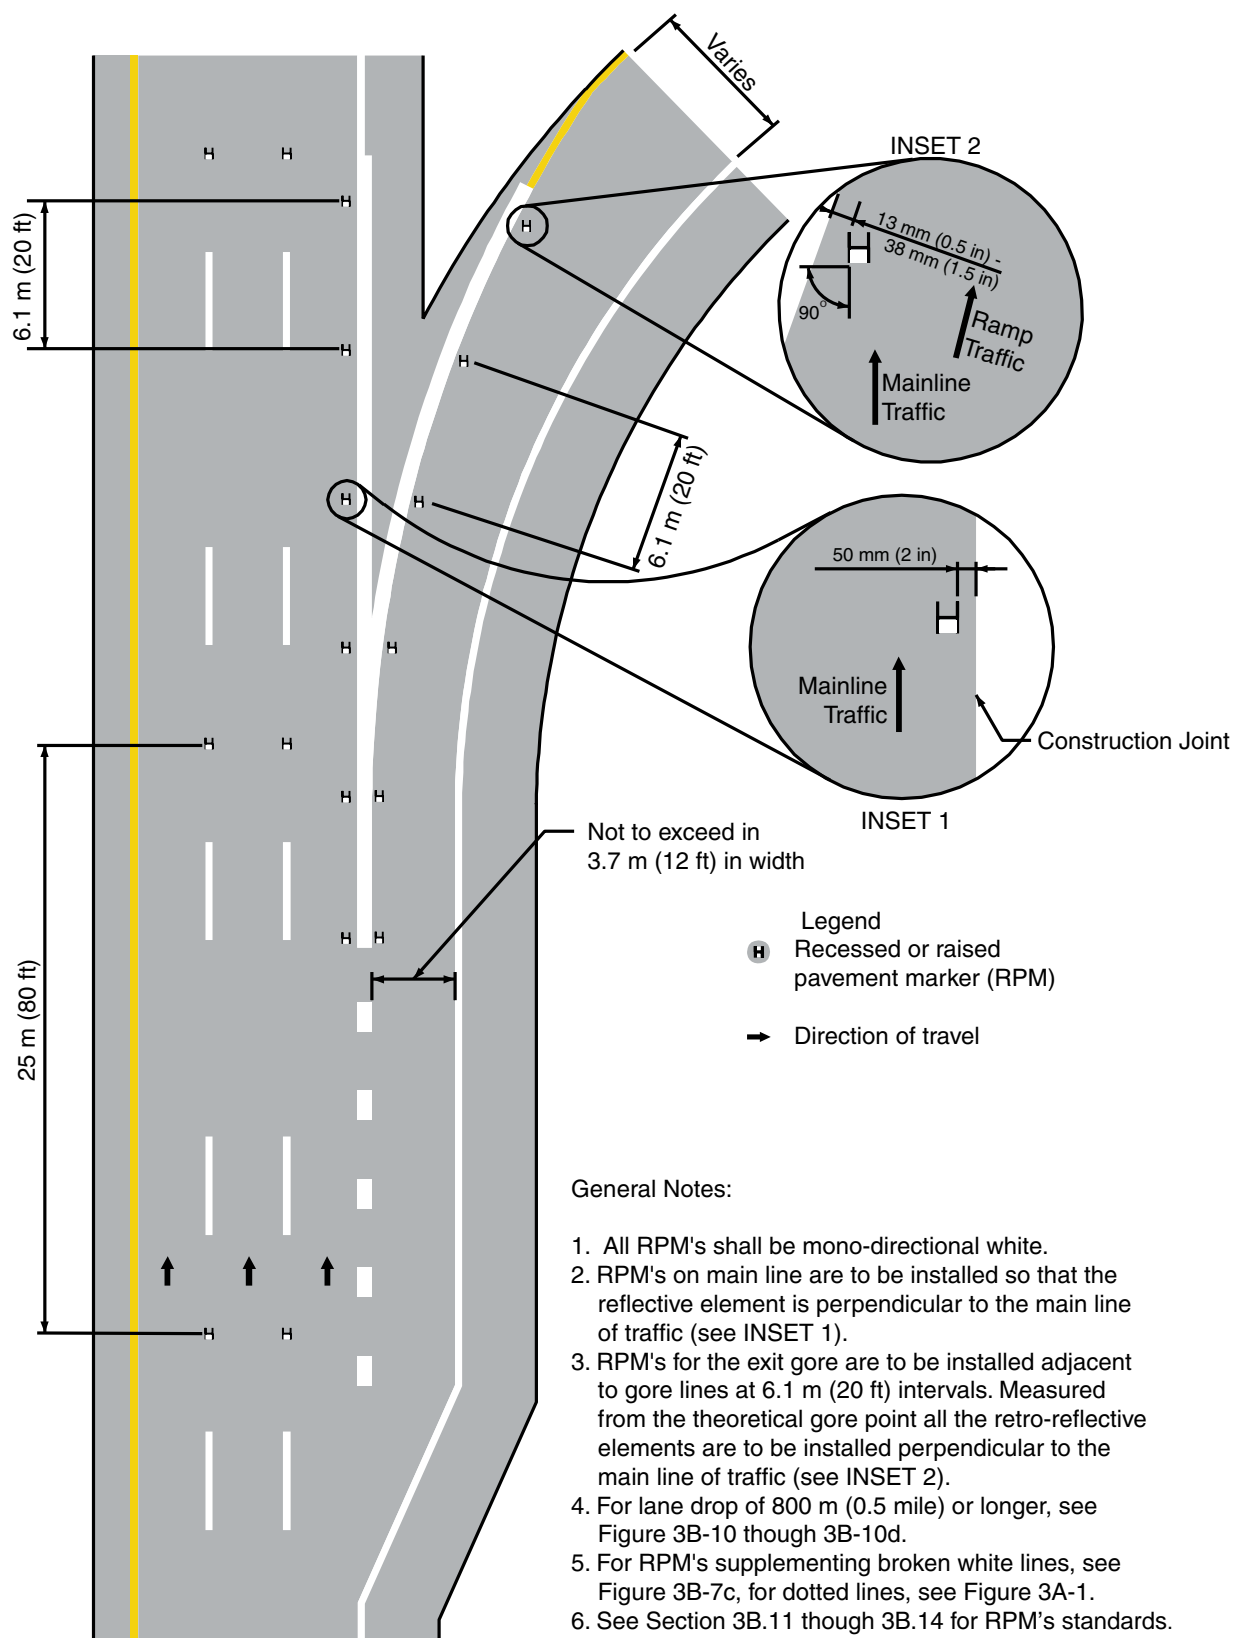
B-8. Examples of Channelizing Line Applications or Exit Ramp Markings (Sheet 3 of 4)
